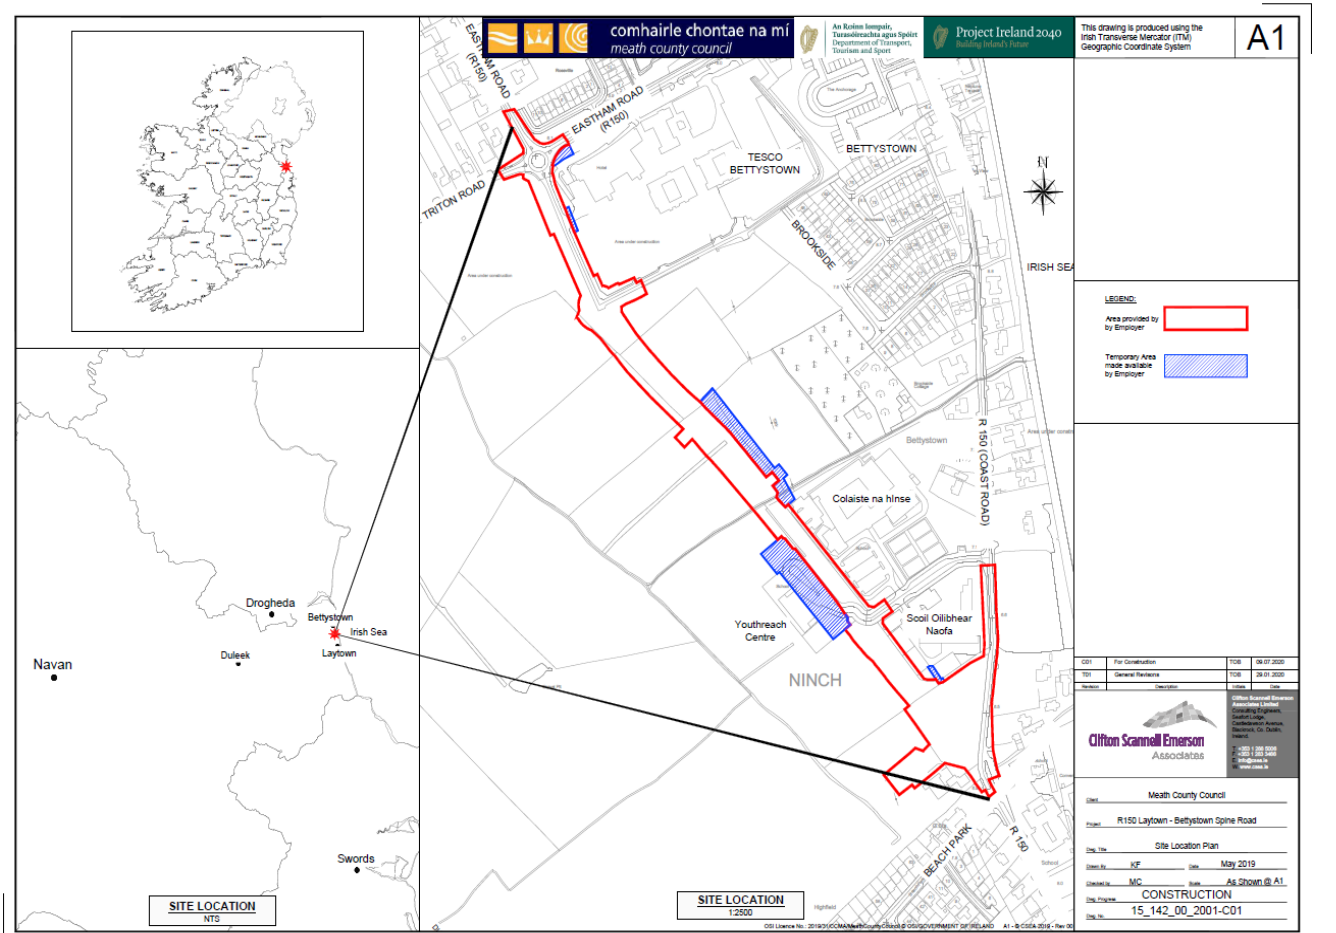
Extent of R150 Laytown-Bettystown Spine Road Scheme
